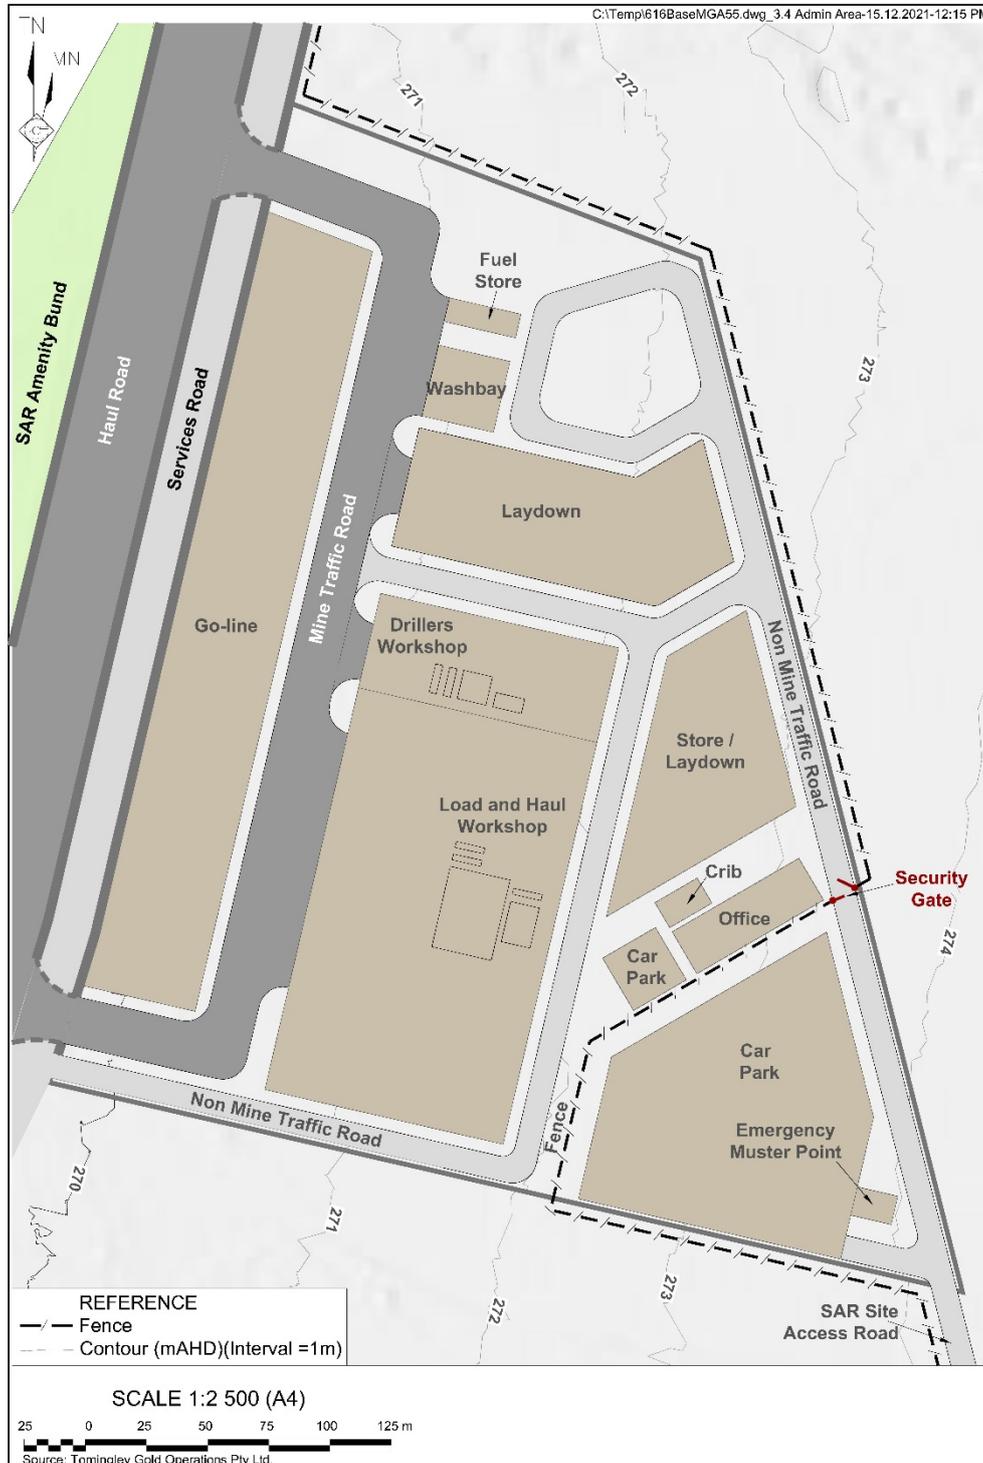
SAR Mine Internal Road and Parking Infrastructure
